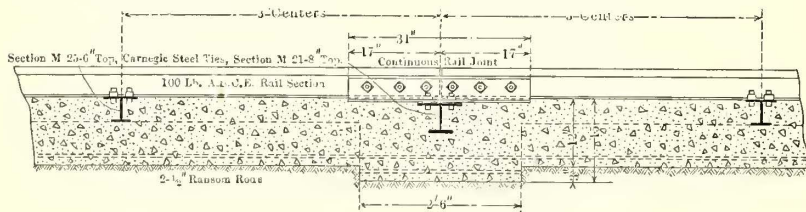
Oklahoma Track—Concrete and Steel Tie Construction
